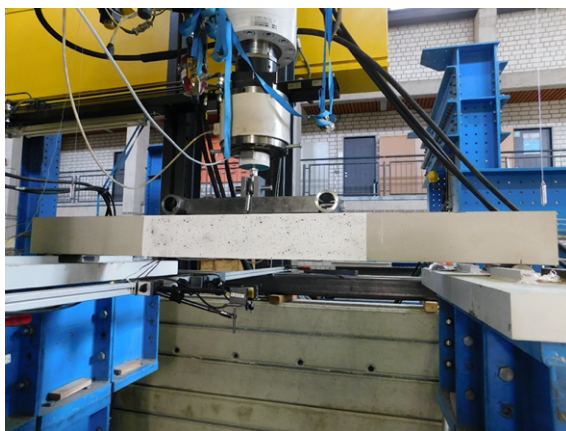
Test setup for four-point bending of a concrete beam with steel reinforcement
